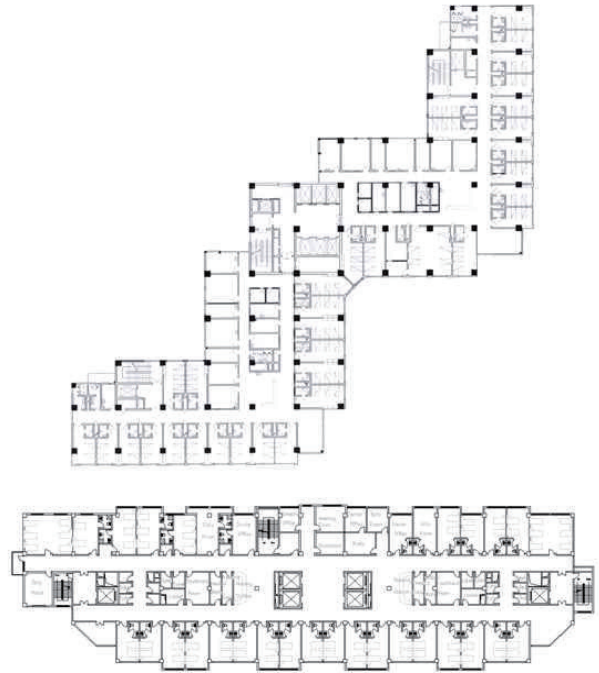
Typical Floor Plan of Hosp-6 East Branch and Hosp-4
